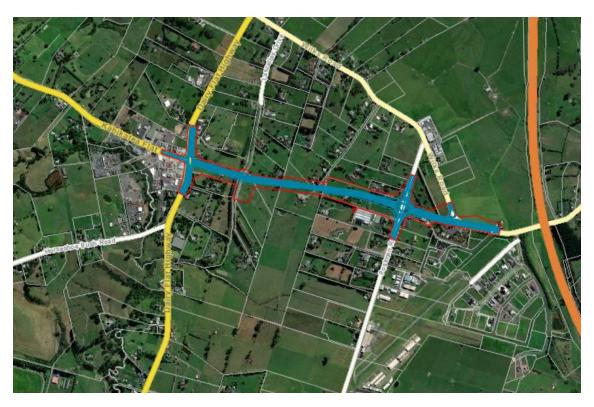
Preferred route for New Connection from Dairy Flat Highway to Wilks Road.
